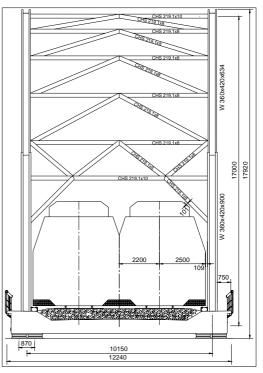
Front view of the example 100 m span railway bridge, unit: [mm]
